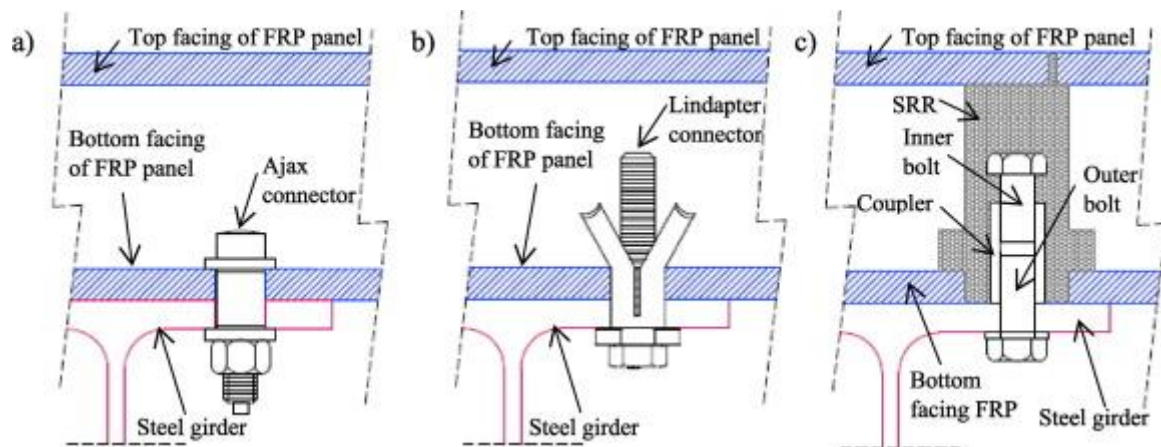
Blind-bolted connectors for FRP bridge deck-girder connection (a) Ajax, (b) Lindapter, (c) iSRR (F. Csillag, 2021)
